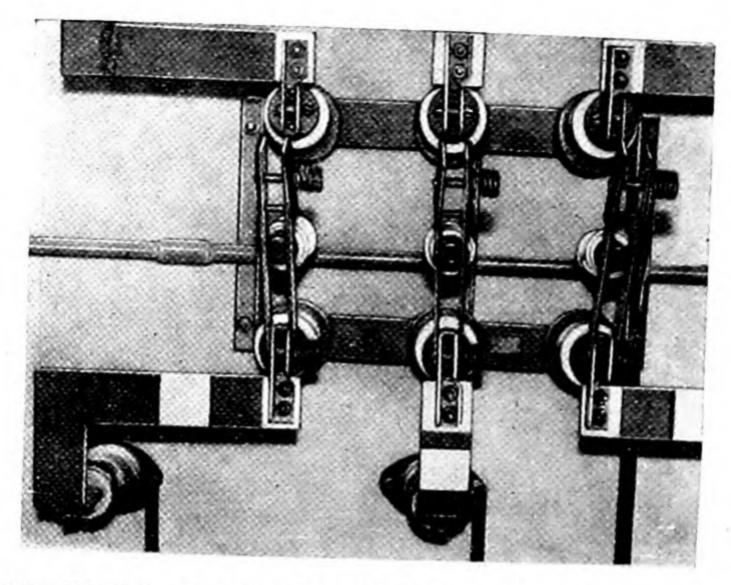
Buses connected to isolator with welded joints to avoid bends
